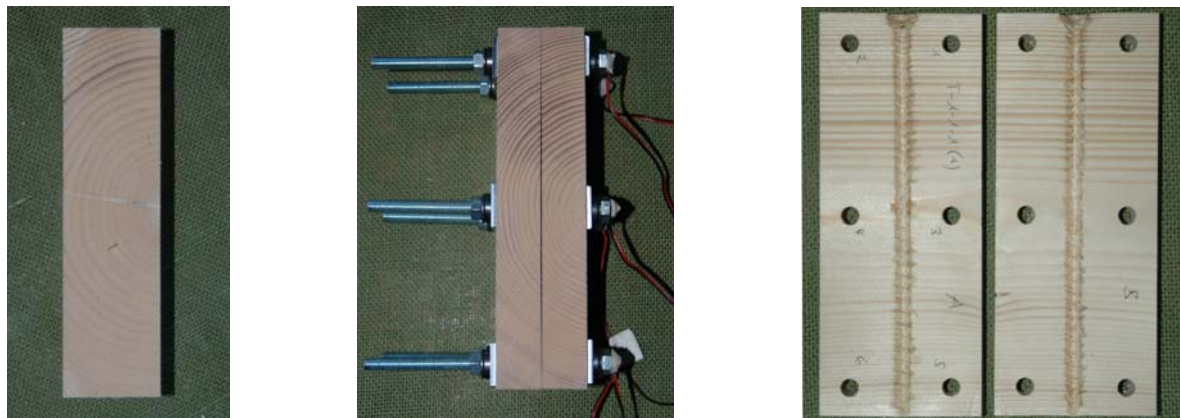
Two-part test specimen connected with measurement bolts (middle) made of one cross section (left), opened specimen after the test (right)
